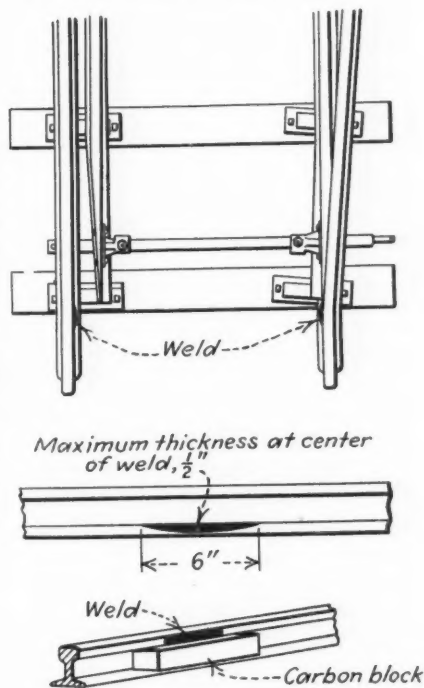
Top, location of bumps with respect to switch points; center, dimensions of bump, which is welded on the ball of the rail; bottom, showing use of carbon block in welding bump
